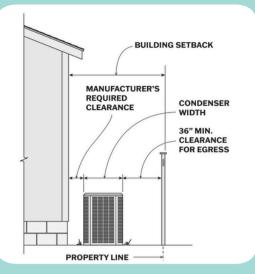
Mechanical Equipment Side Yard Setback Encroachment
